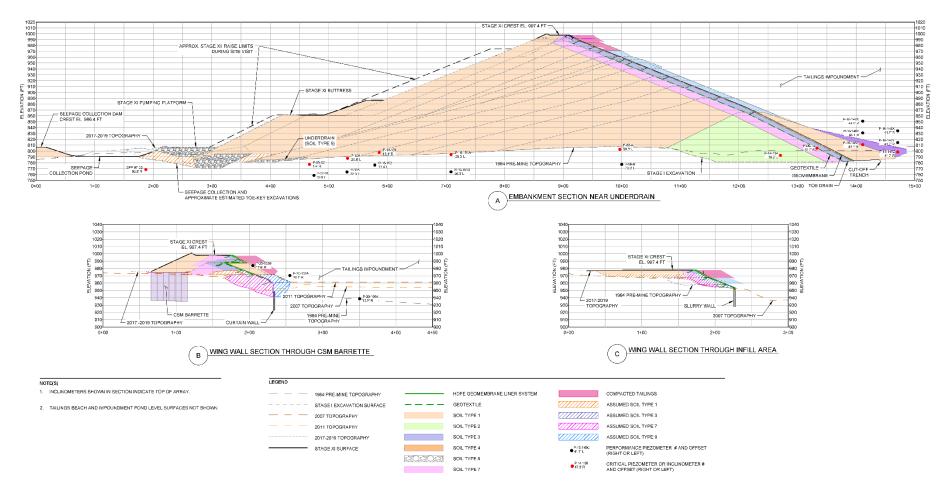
Typical TMD Sections at Embankment (A) and Wing Wall (B and C)
